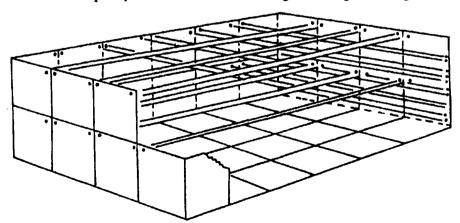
TYPICAL LAYOUT OF INTERNAL STAY BAR SYSTEM FOR SUPPORTING PANELS
